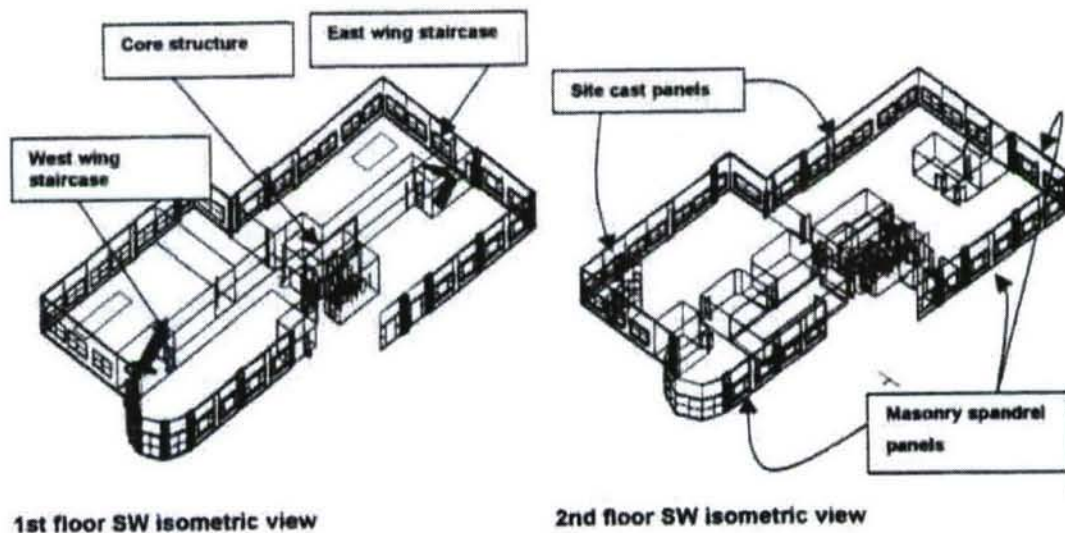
From Koo and Fischer (2000); Building Configuration of Office Building
